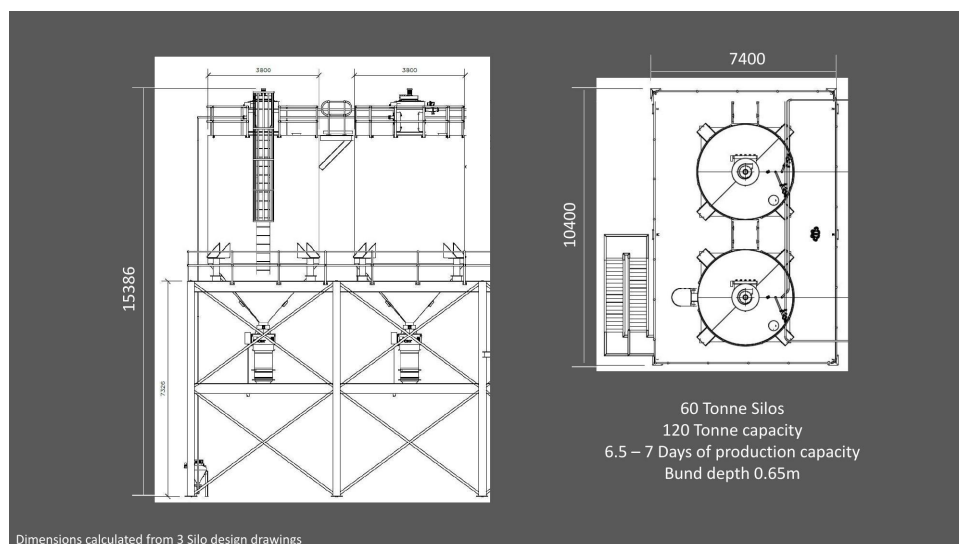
Two 60 tonne silo configuration: elevation and plan, 120 t total capacity, 0.65 m bund depth.
